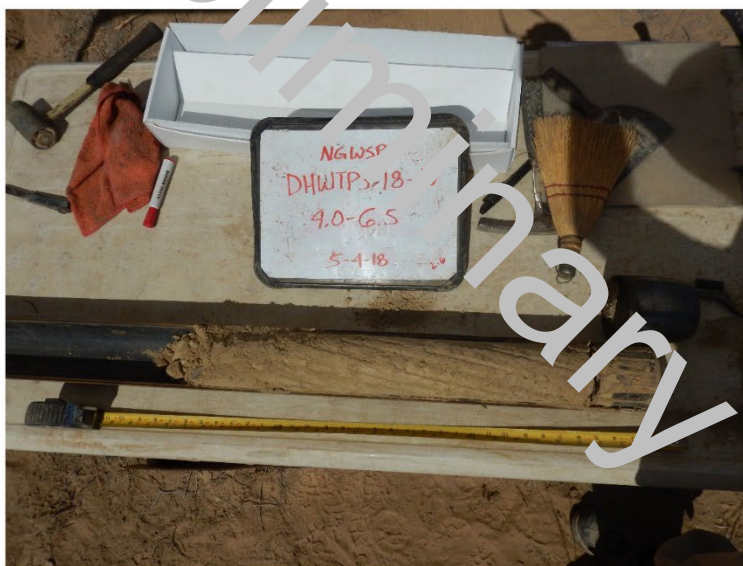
/4/2018 NGWSP, SJWTP, DHWTP3-18-10 (4.0-6.5 feet). Photo By: P. Gardner
